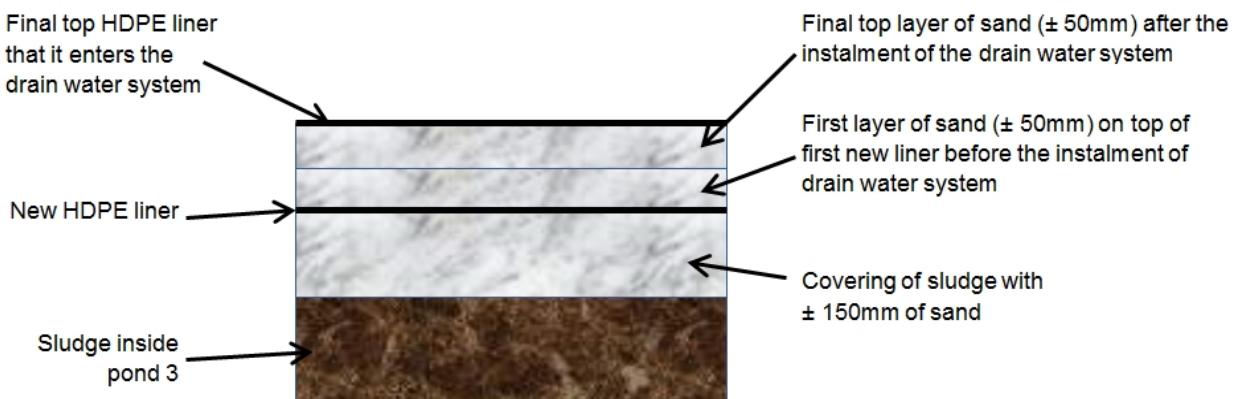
Schematic sludge, sand and HDPE liner layout inside Pond 3
